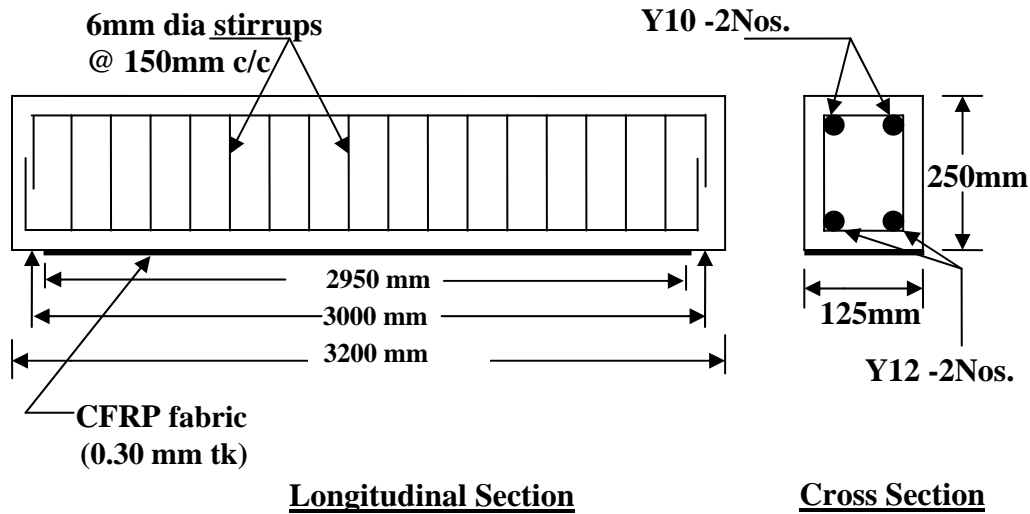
Longitudinal and Cross Section of Strengthened Beam
